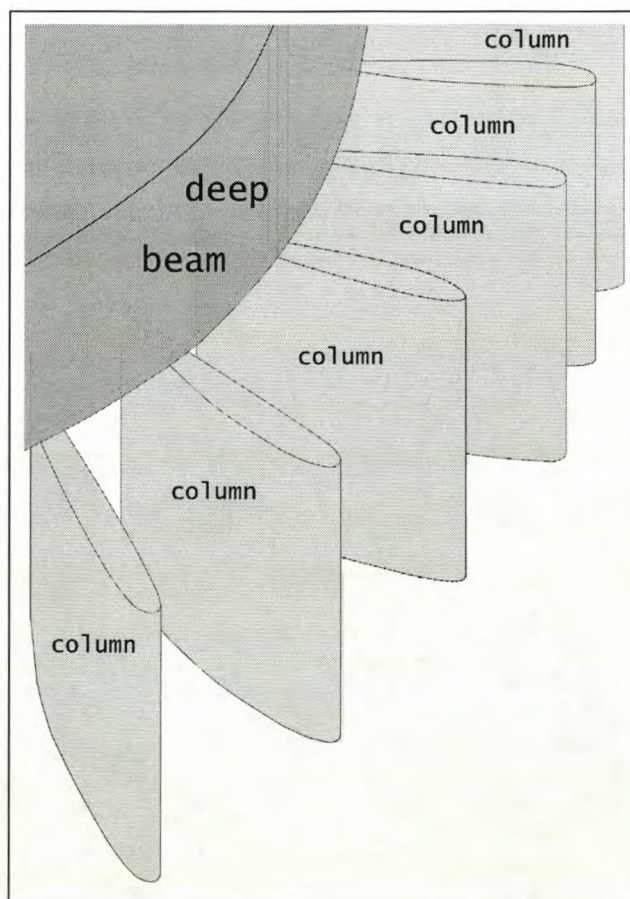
The base of the chimney structure – a type of continuous deep beam – resting on the IGV's – a type of column.
